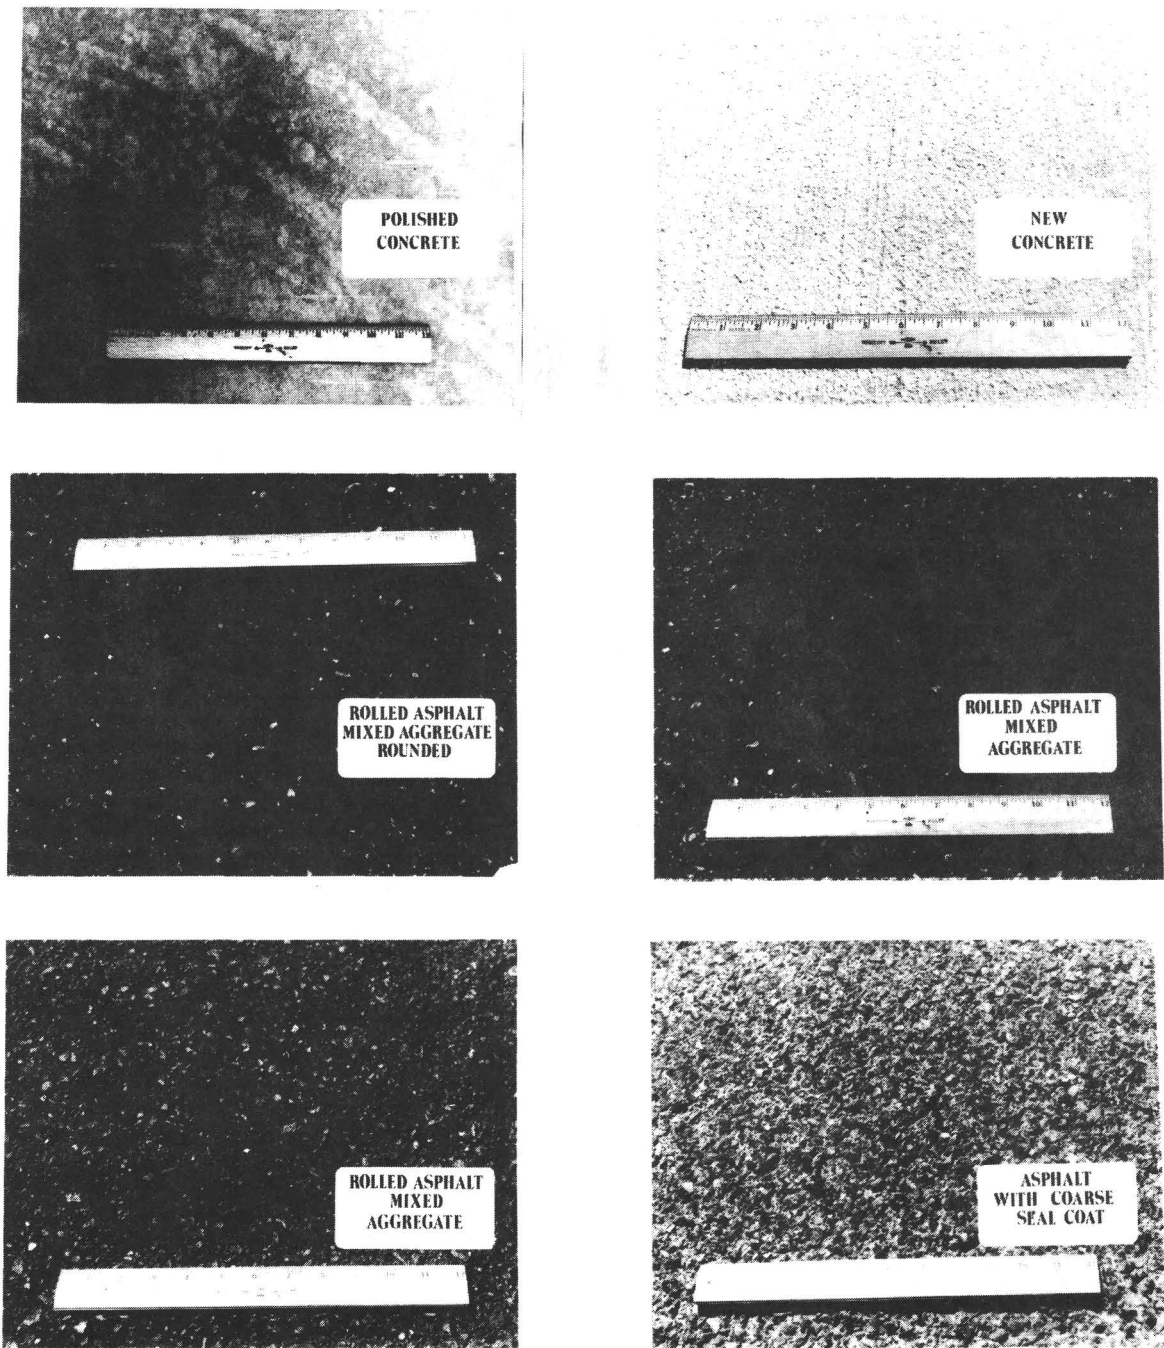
Outdoor test surfaces - Pavement test surfaces
